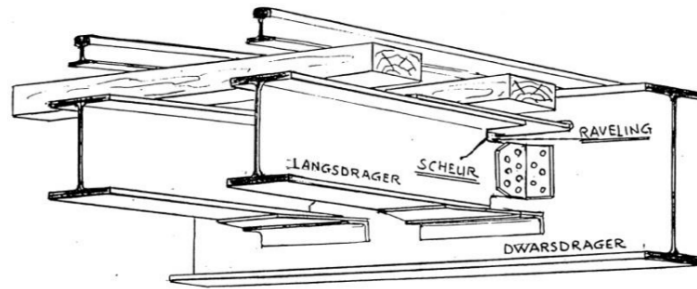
Coped beam connection [37] with notes in Dutch:
